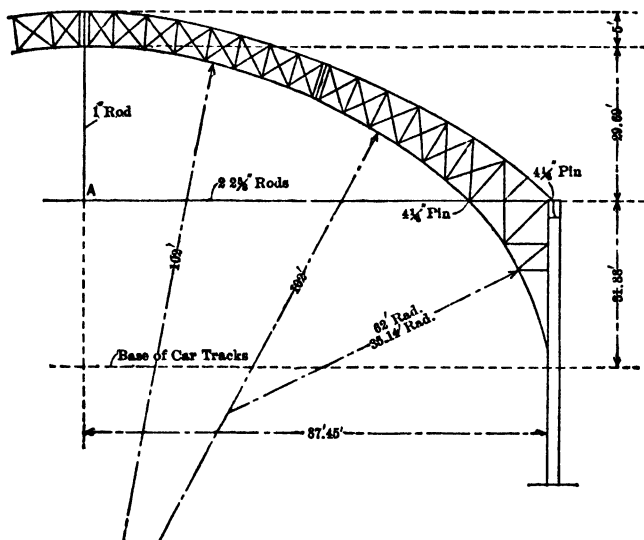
Arched Truss for Sullivan Square Station, Elevated Railway, Boston, Mass.
